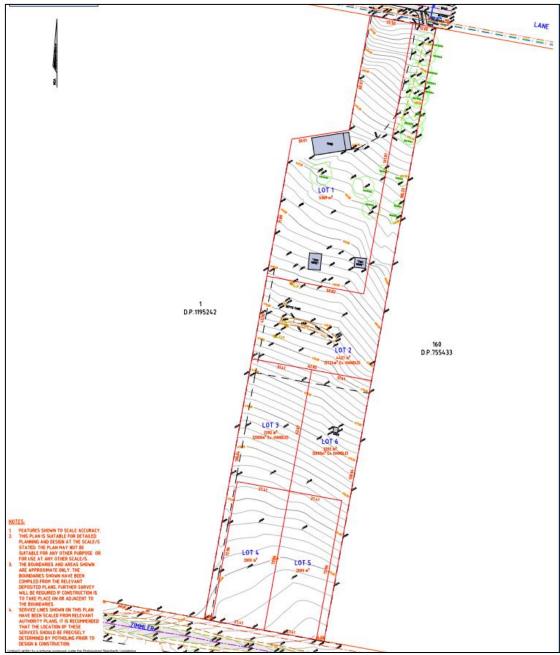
Proposed subdivision plan (source: de Witt Consulting)
